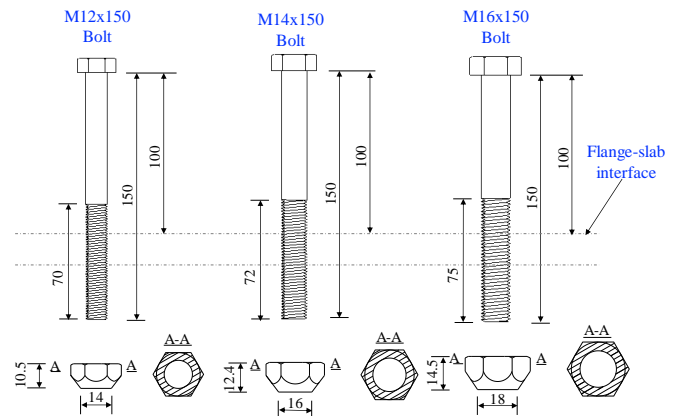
shows the configuration for the conventional HSFG bolt and the novel demountable LNSC, and geometric details of novel bolted connectors installed to the steel beam flange in the test specimens.
